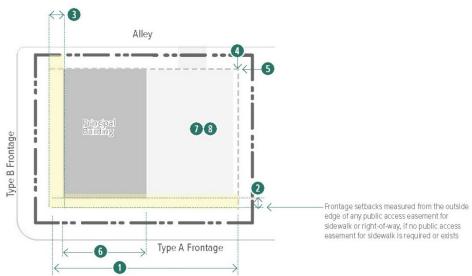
Commercial Storefront Building Plan: Building Siting Requirements
